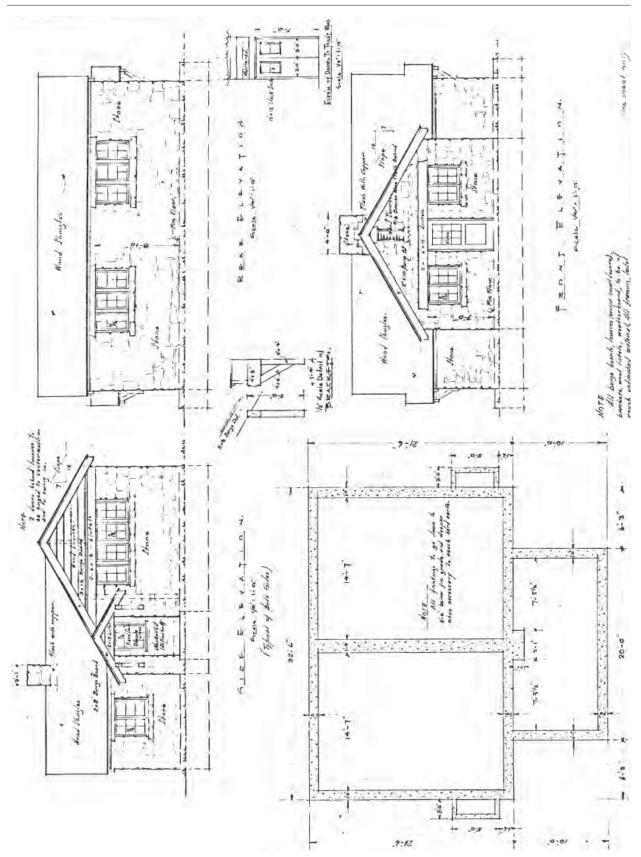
A laundry / bath house (HS-414) was built as a one- and a half story cross-gabled stone building with timber sills, stone steps leading to a basement, and a gabled rear porch entry, 1935. (OZAR Archives)
